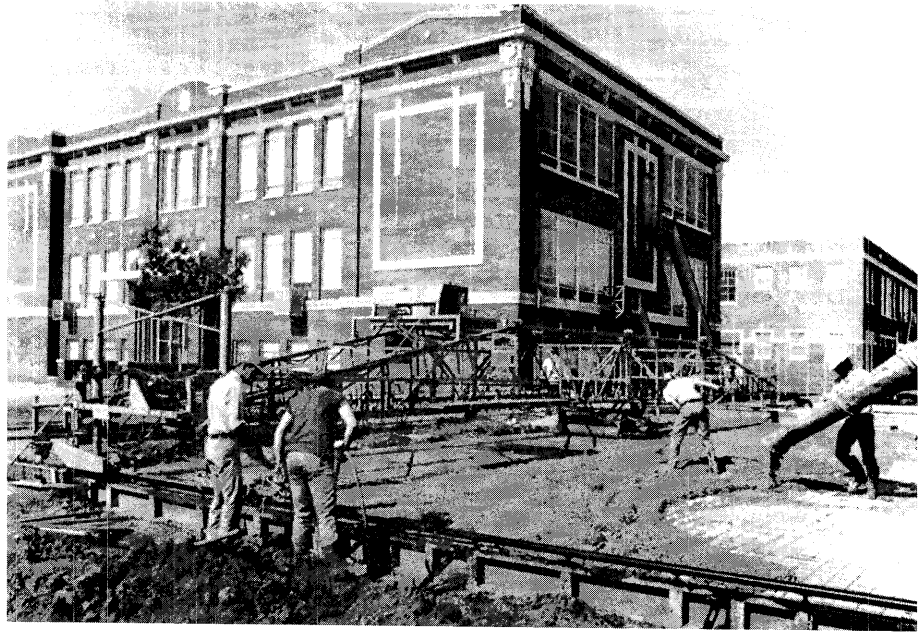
Roller finisher being used on large slab pour. (Courtesy of Terex Roadbuilding)
